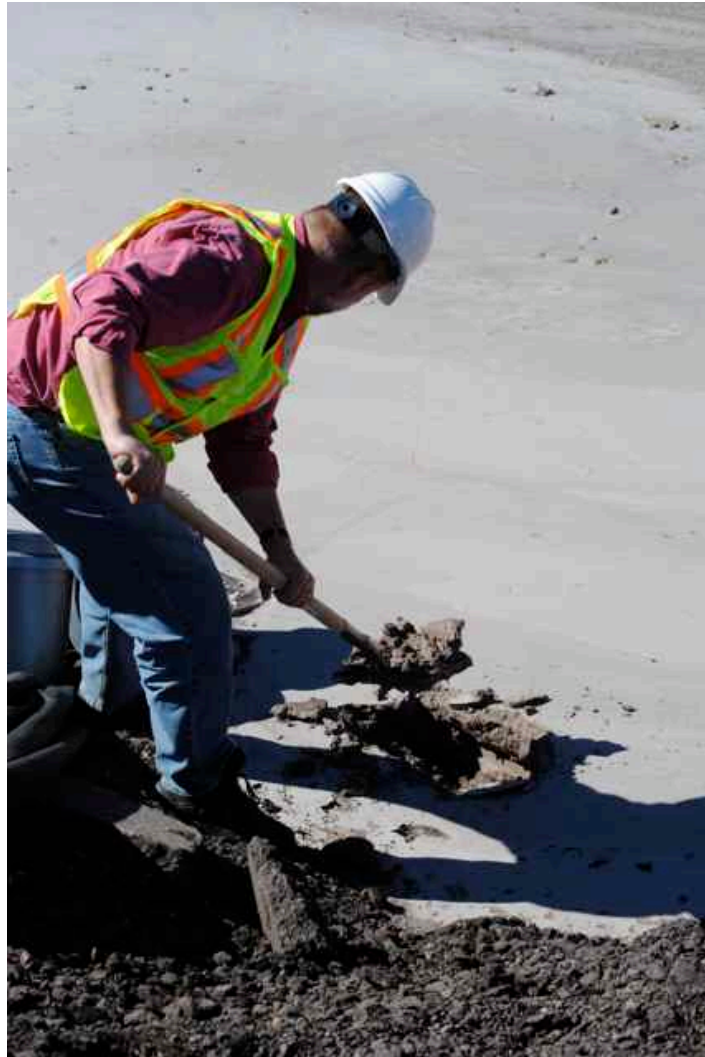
Sampling of concrete pavement grinding sediment disposal lagoon.
